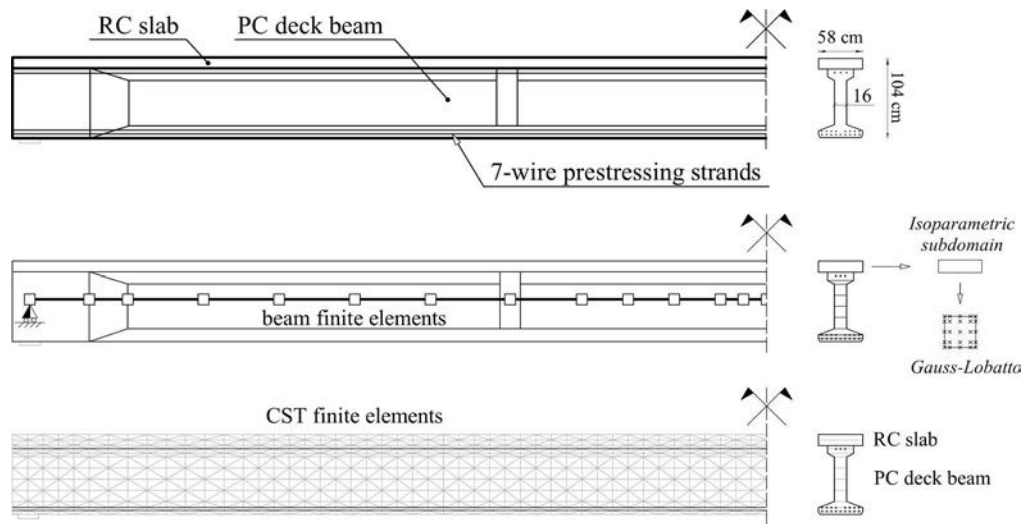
PC bridge deck beams: Longitudinal profile, structural modeling, and element discretization based on BFE model with isoparametric discretization and Gauss-Lobatto integration scheme and MCFT model with CST finite elements.
